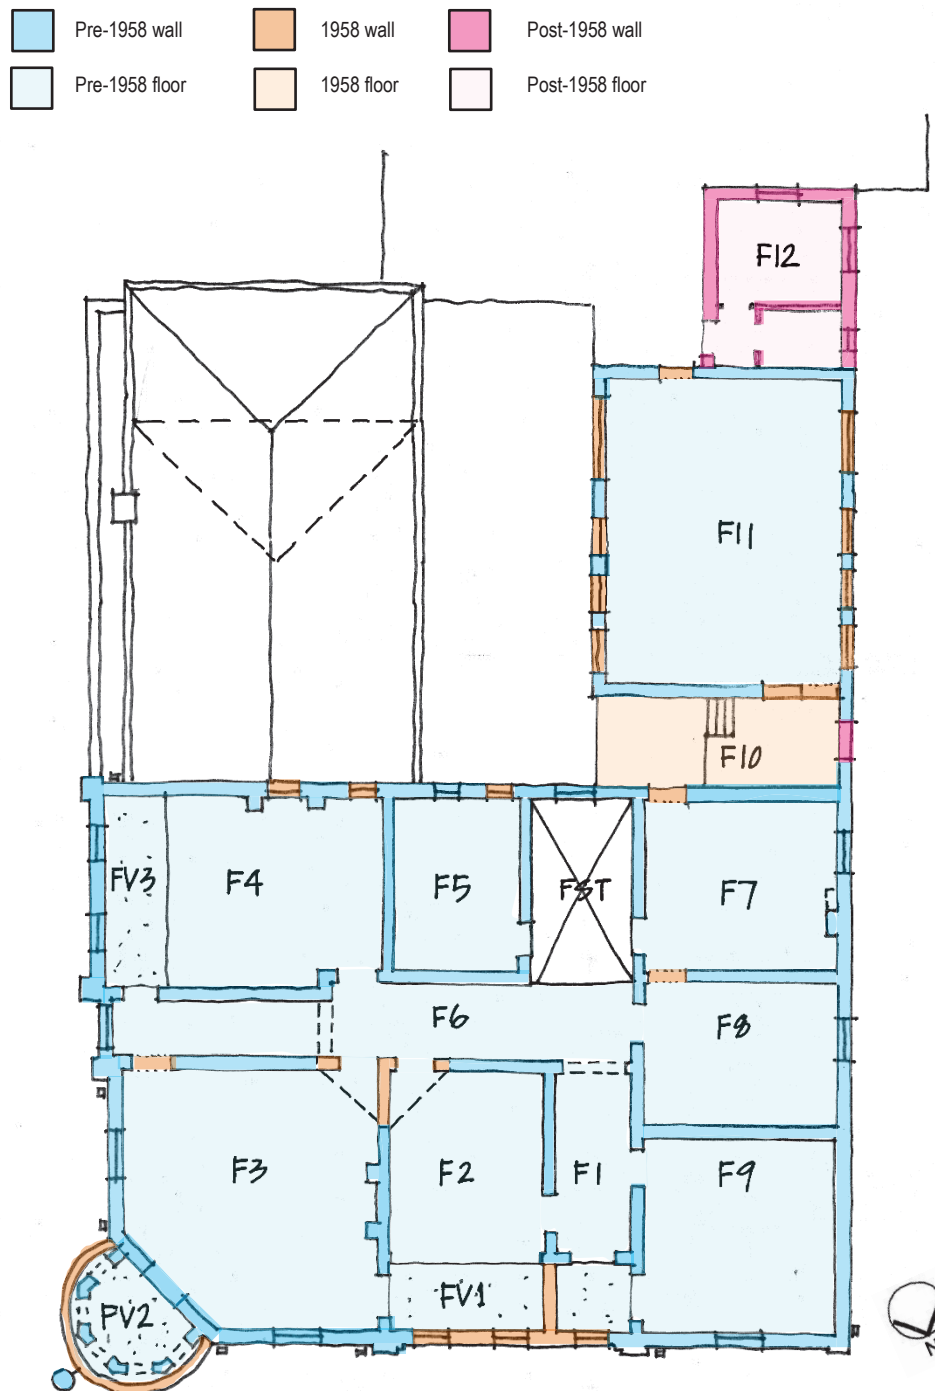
Diagrammatic first floor plan showing existing fabric from different eras
